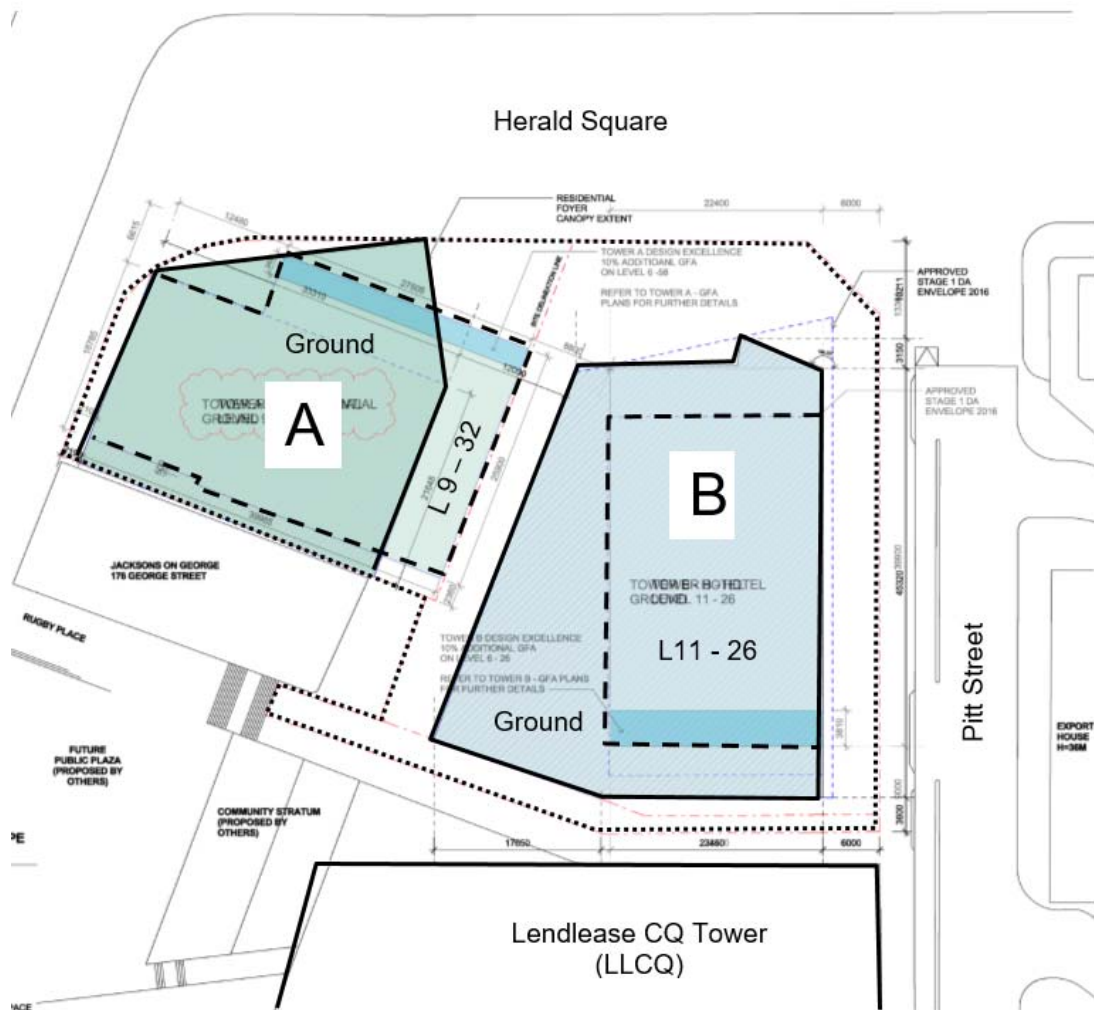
An overlay of Ground and upper tower setbacks on Tower A and B in relation to adjacent development and site boundaries
